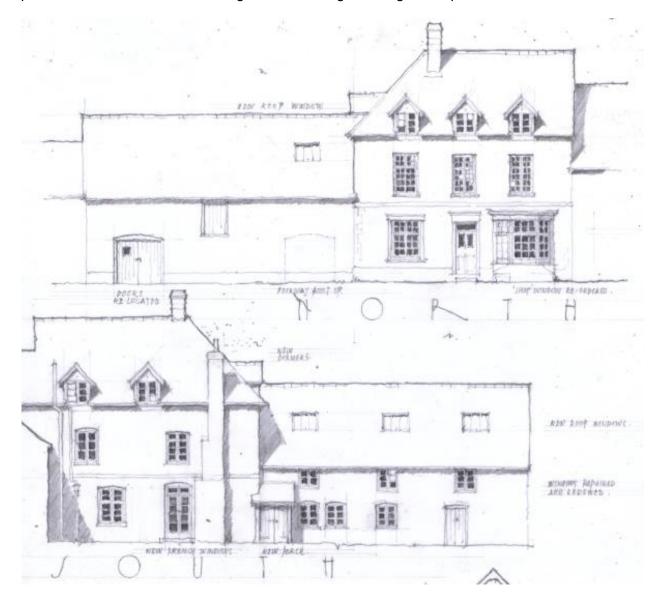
North and South Elevation Plans approved pursuant to P184664/F and P184665/L
